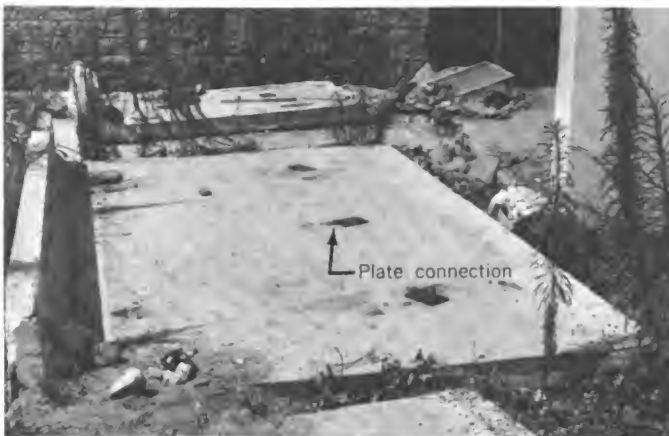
Olive View Hospital, medical treatment and care unit. Masonry veneer walls lying on ground-floor level. These fell away from building due to earthquake movements.
